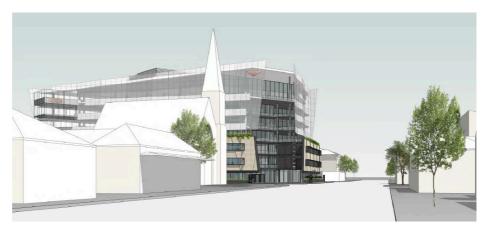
Streetscape render of approved scheme, viewed from Portrush Road looking South. Approved rooftop only partially visible behind and slightly over façade screen.
